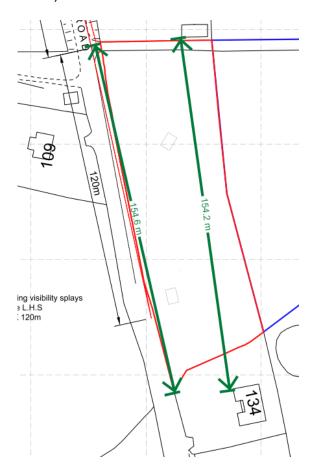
Proposed site location plan showing measurements of road frontage and 'gap' between buildings. This is measured using the Mastergov system.
